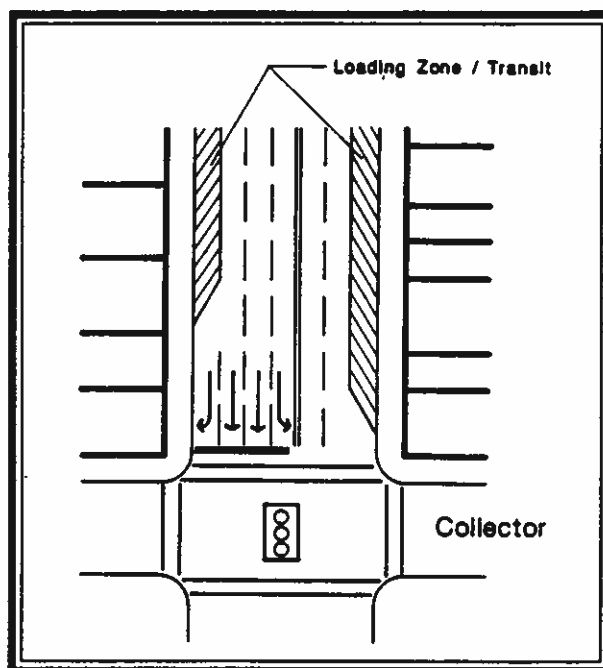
Typical Treatments for On-Street Truck Loading Zones
